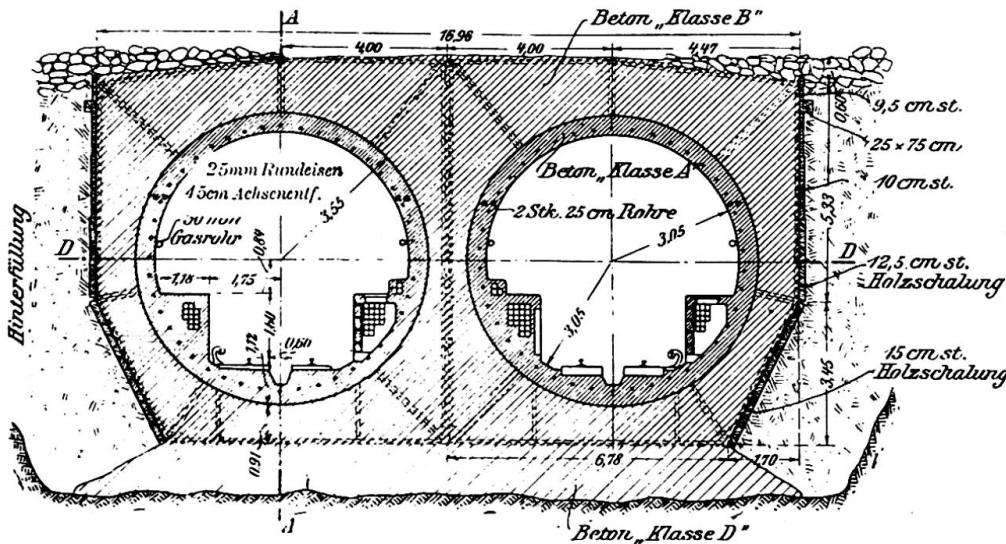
Cross section: Michigan Central Railroad tunnel in Detroit
